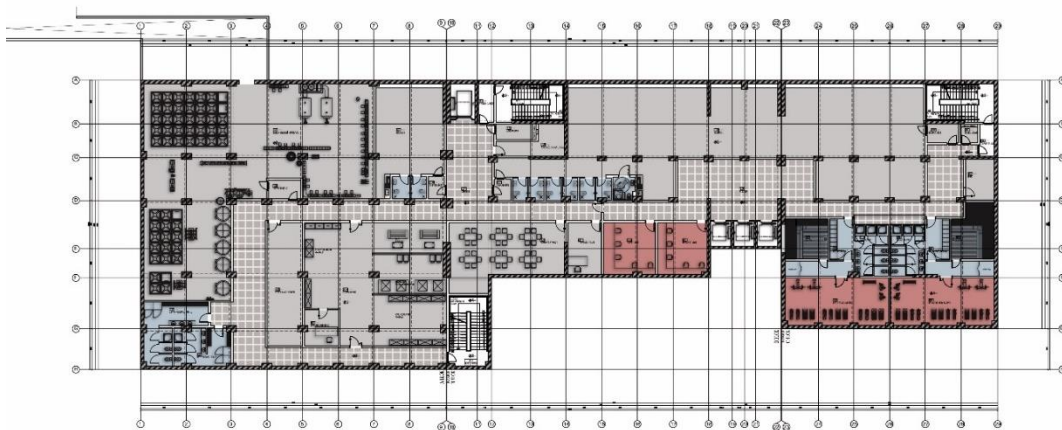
300-bed teacher's house basement floor plan, Çelik, 2017
